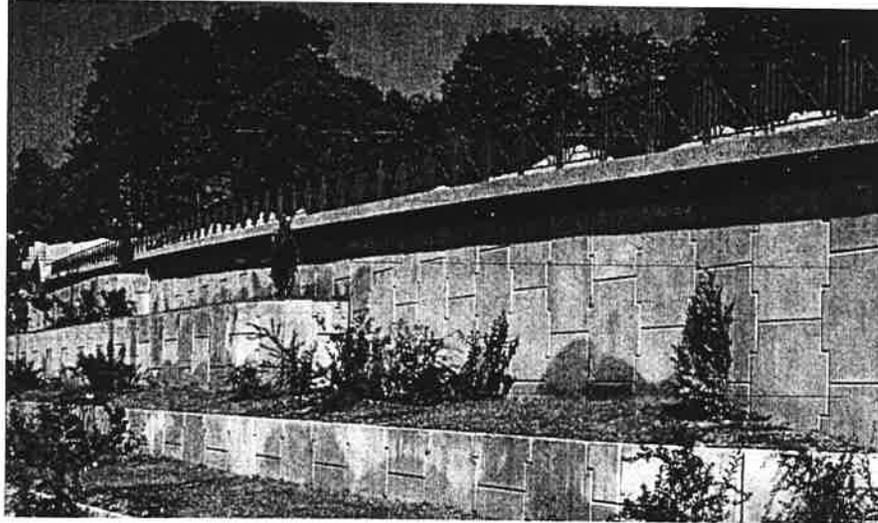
Examples of Reinforced Earth Retaining Wall Systems
